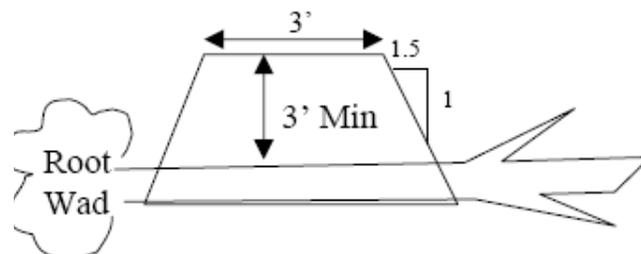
Cross-Section of a Tree Built Into a Traditional Vane
